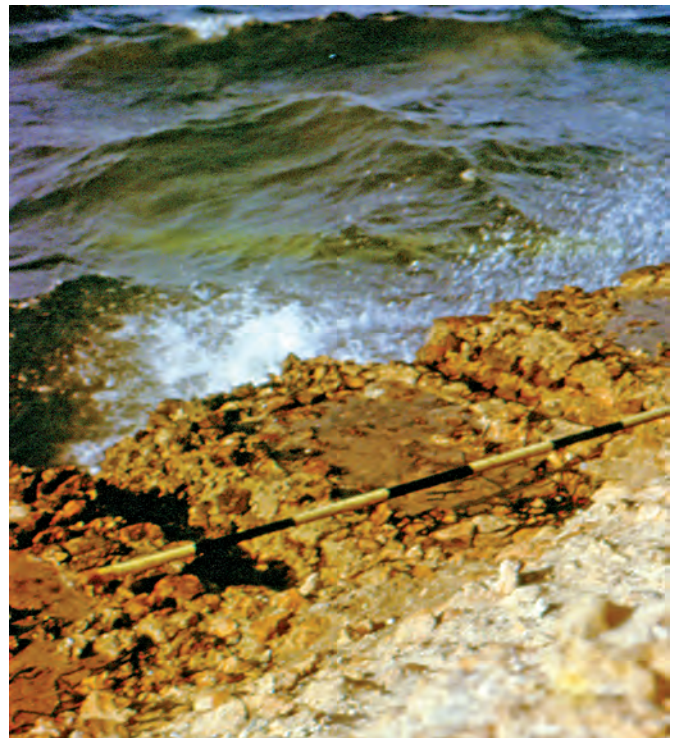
Thapsus; horizontal beam impressions in the upper section of the concrete mole (R. A. Yorke; used with permission).
